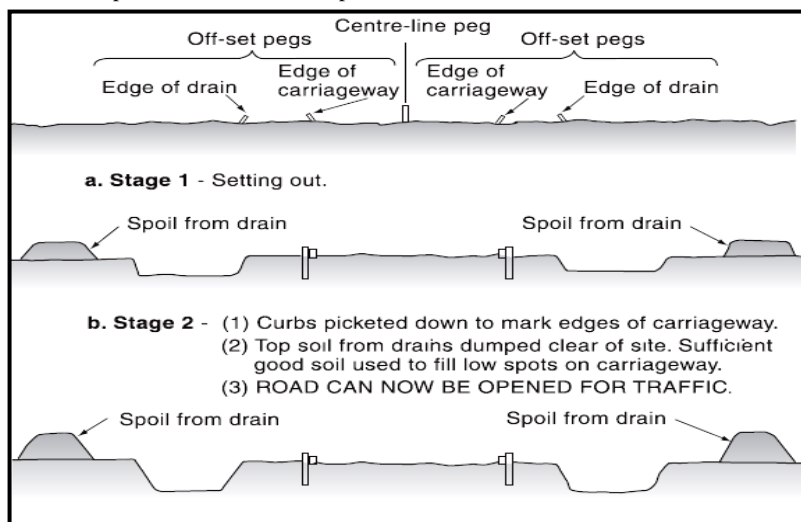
Stages in the Rapid Construction of an Earth Road by Manual Labour.
